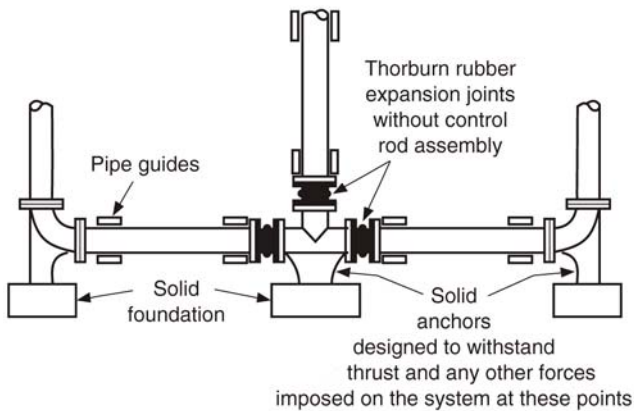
Typical piping layout utilizing Thorburn expansion joints and the proper use of anchors in branch locations
